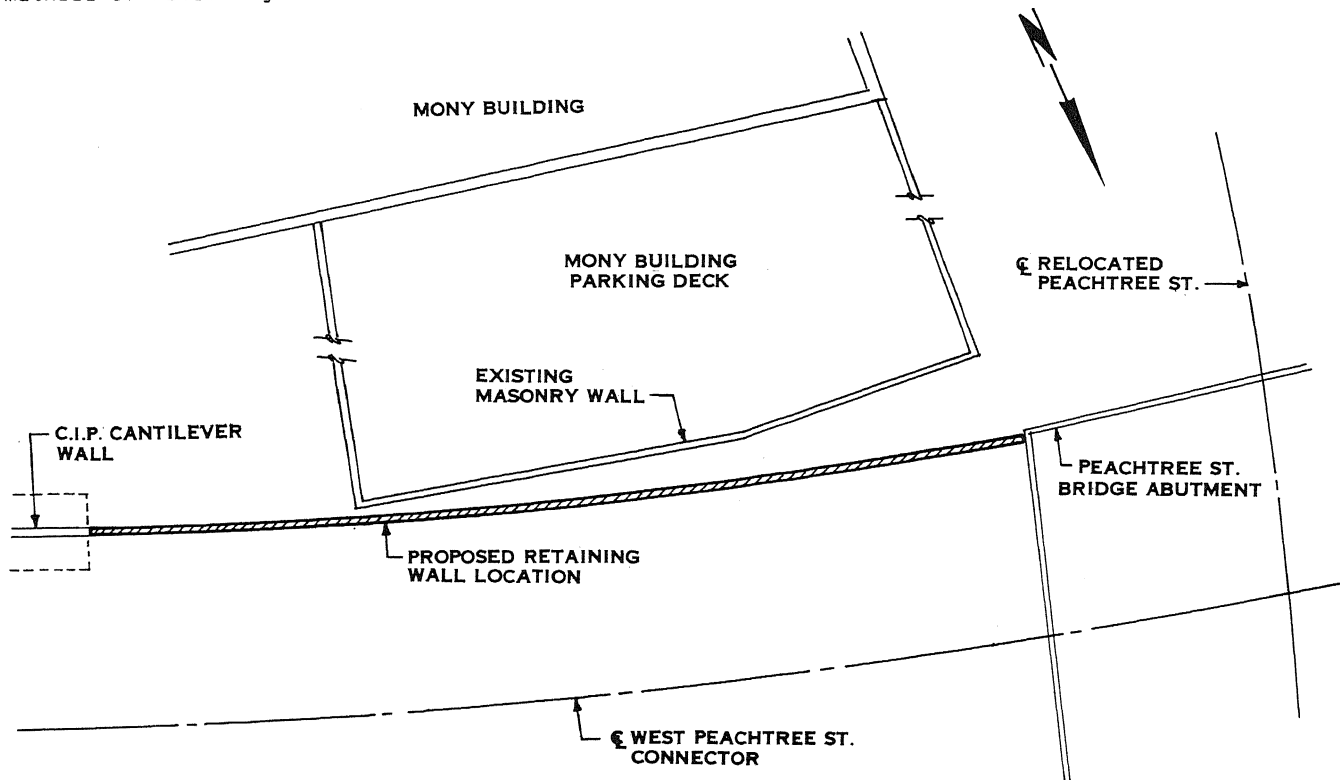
PROPOSED RETAINING WALL LOCATION
